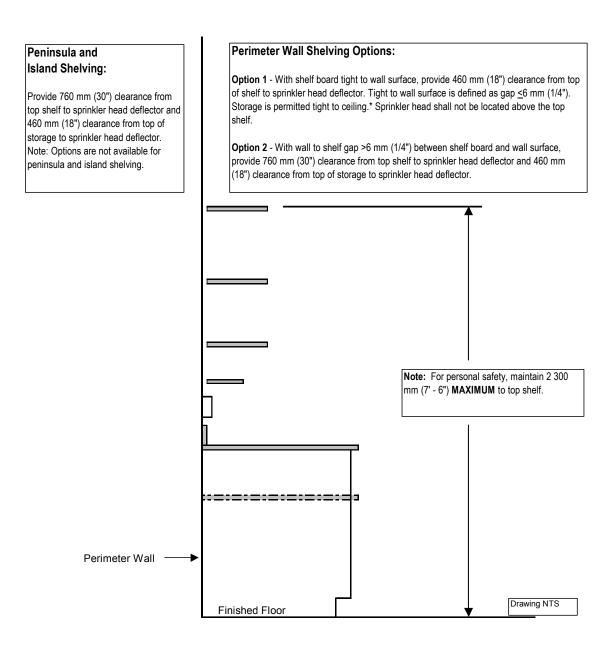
Wall-Mounted and Peninsula Shelving Height Policy Sprinkler Head Clearance to Shelving
